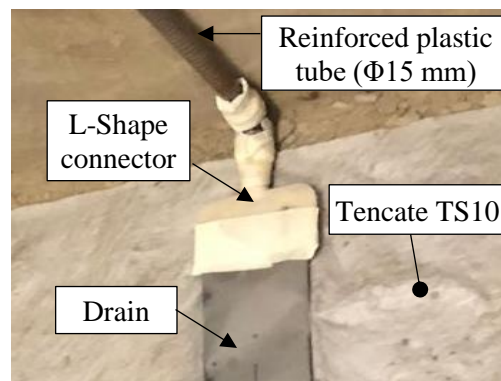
Drain, non-woven geotextile and L-shape connector
